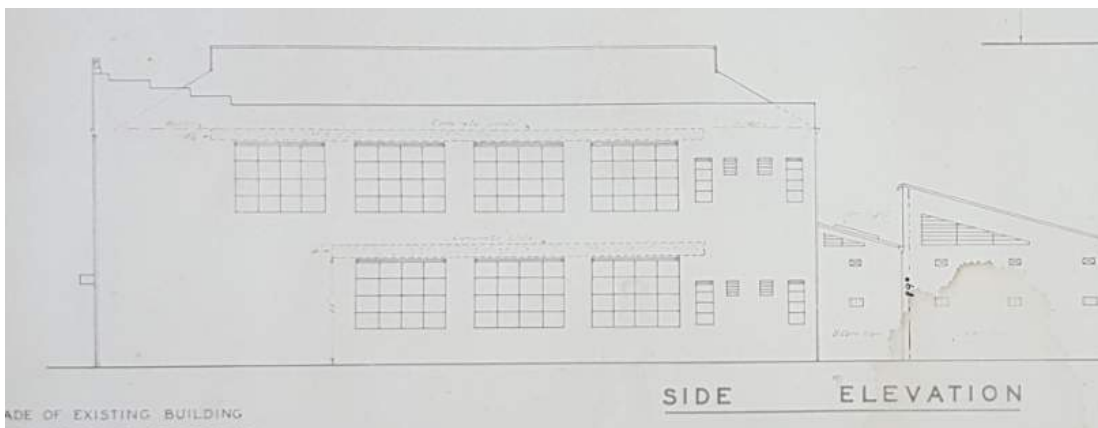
1937 drawings – detail of the east elevation of the new section (PROV, 1937).
